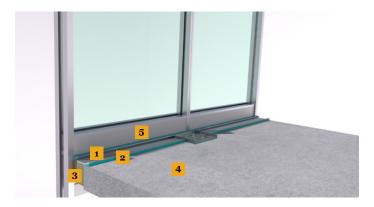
1) Metal sheet, 2) Fire rated silicone, 3) Mineral wool, 4) Concrete slab, 5) Fire rated wall
